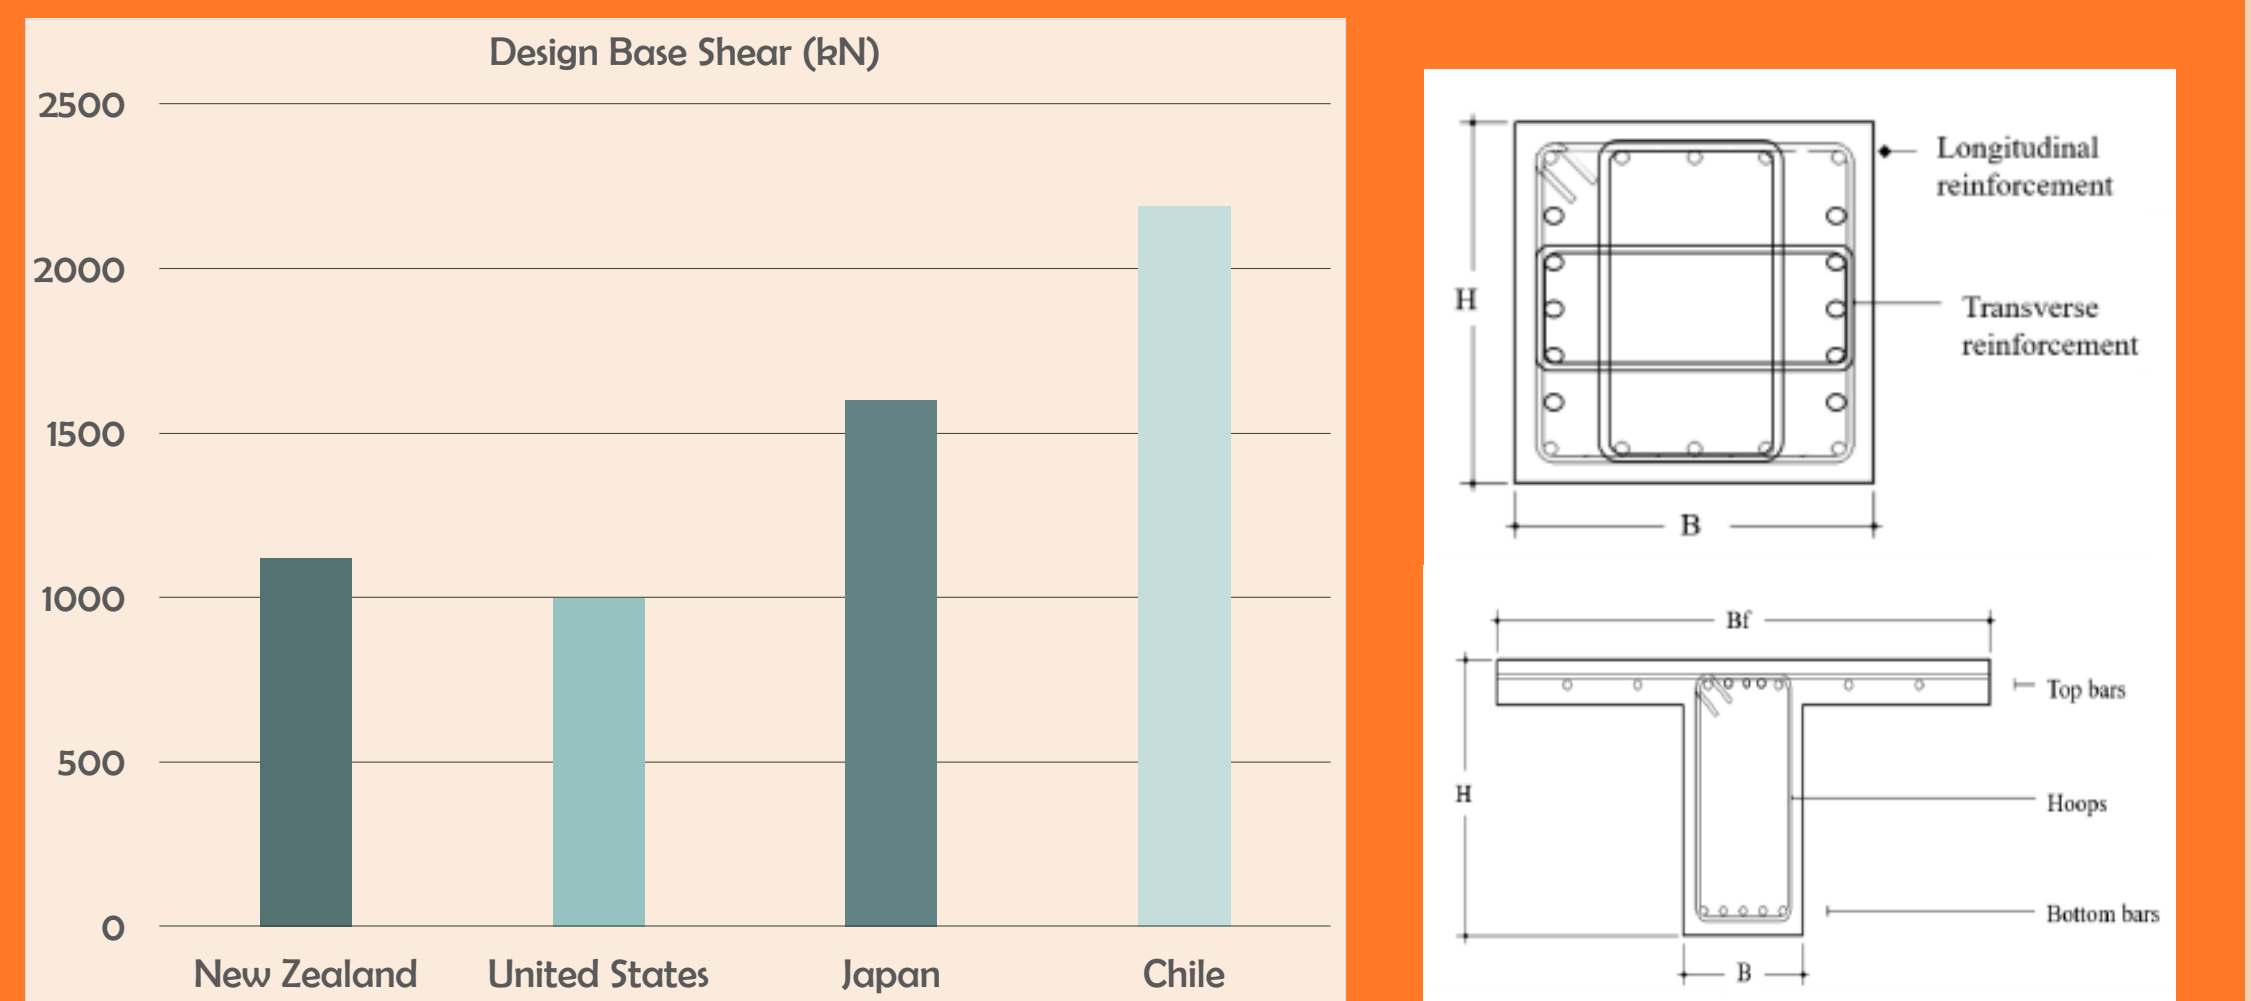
(a) Comparison of design base shears for each moment frame design and (b) Typical column and beam cross-section design
